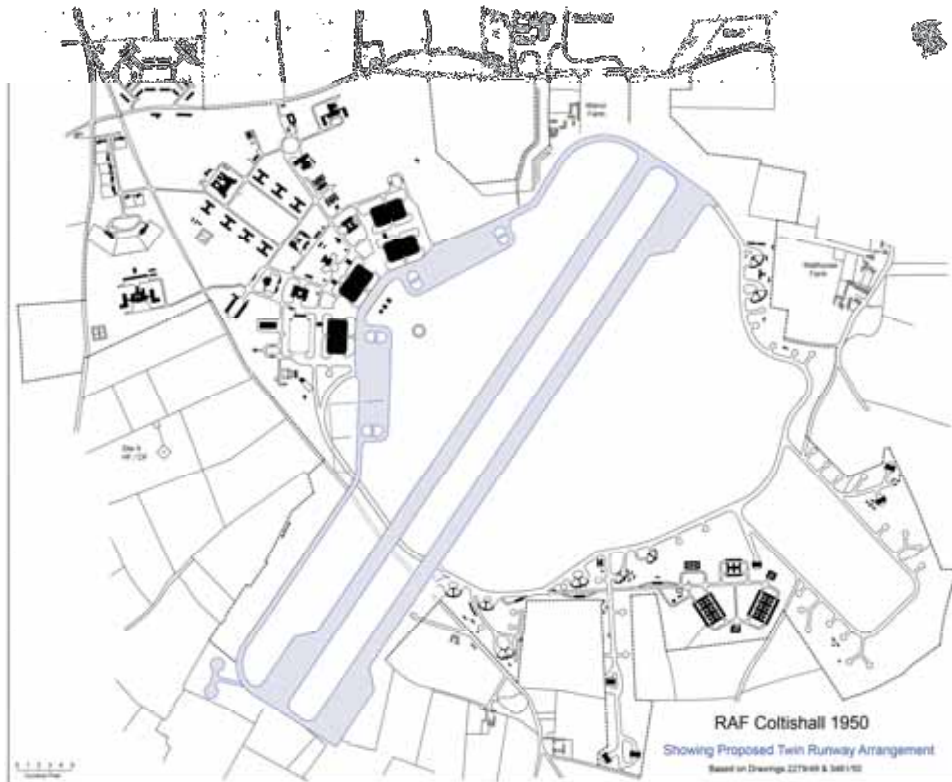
Proposed twin runway arrangement at Coltishall 1950
